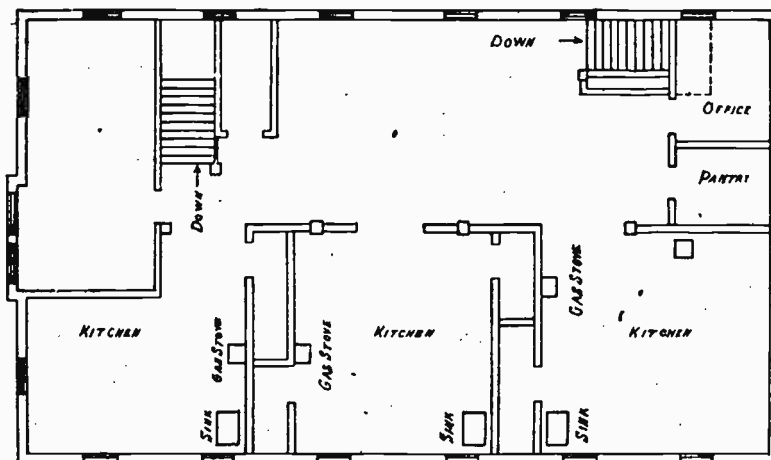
School No. 1. Floor Plans of Unit Kitchens.
